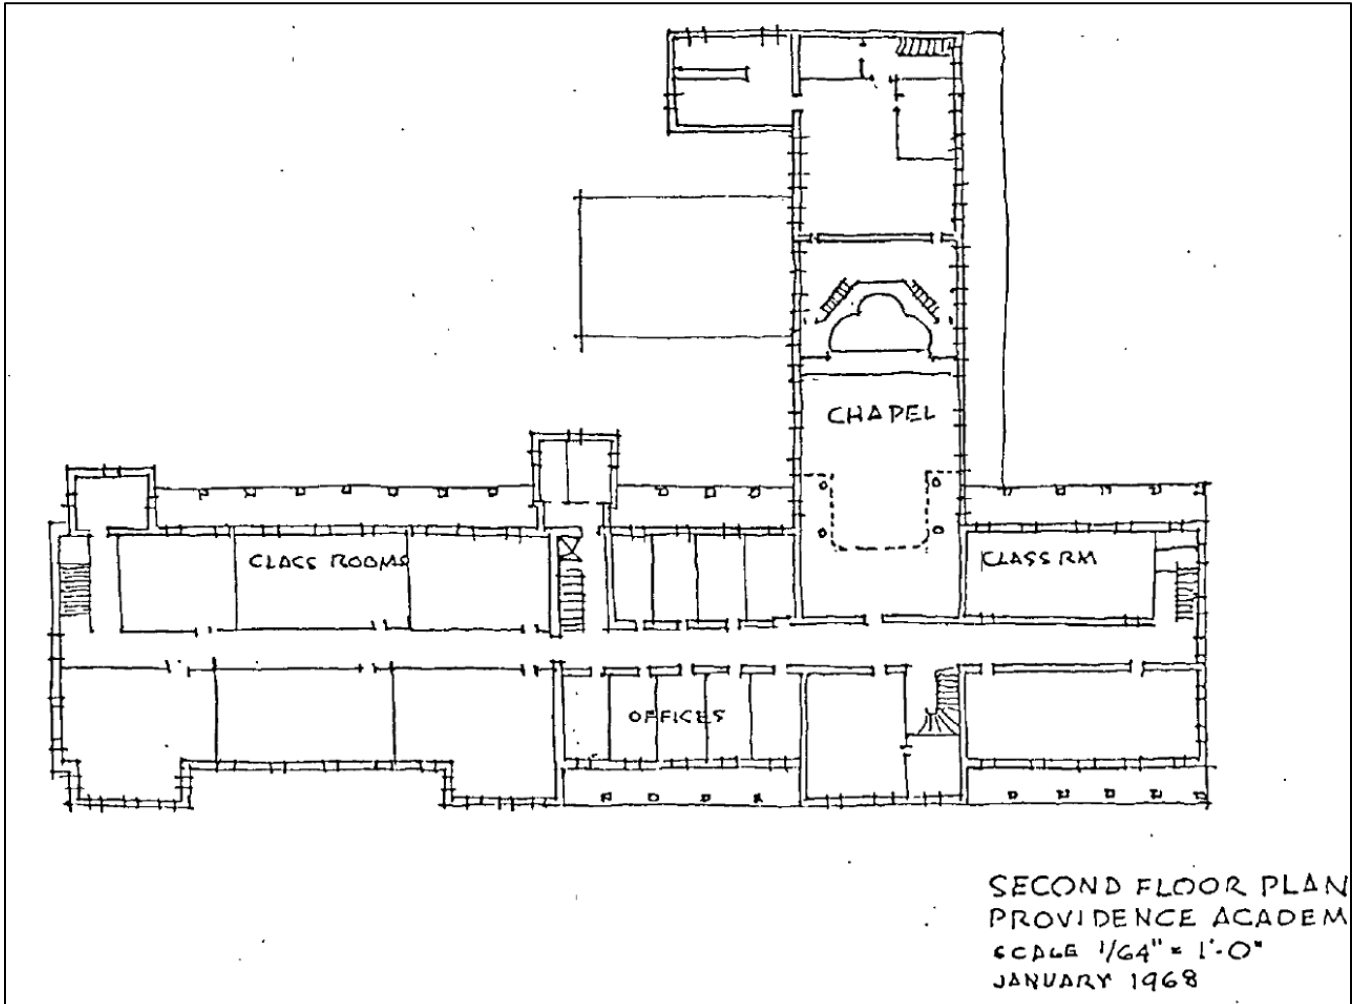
House of Providence second floor plan in 1968 (Lentz, "House of Providence, Vancouver, Washington," Supplemental materials).
